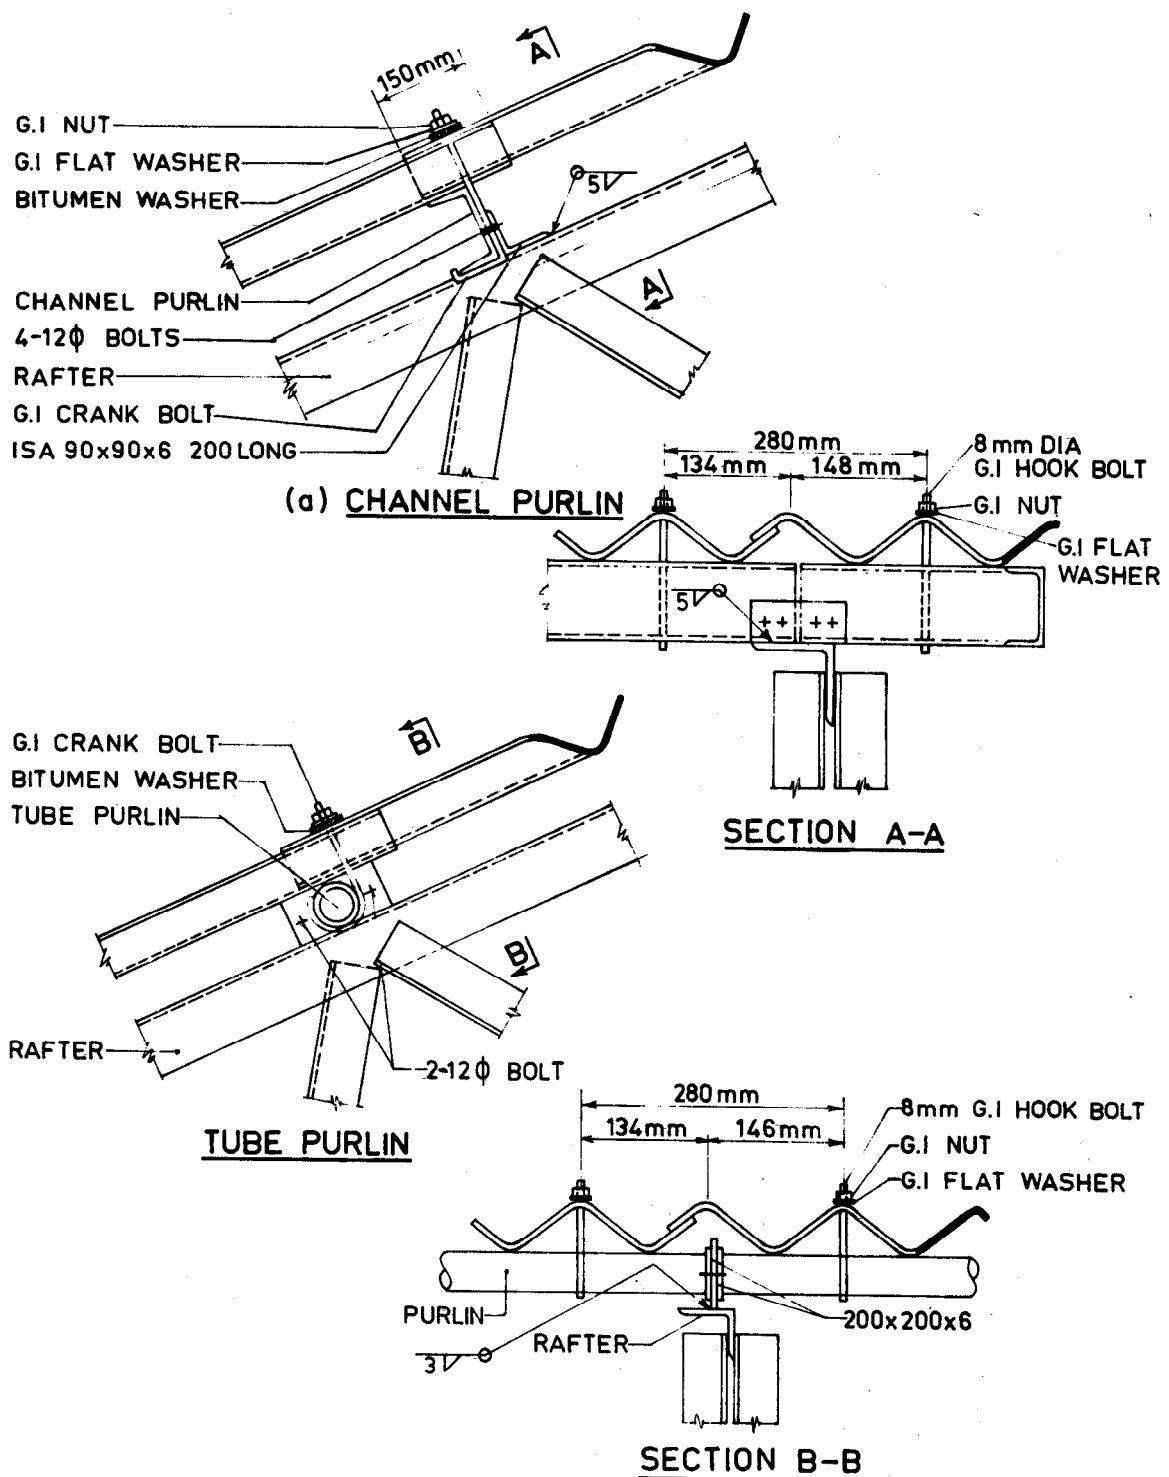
PURFLIN RAFTER AND SHEETING CONNECTIONS
